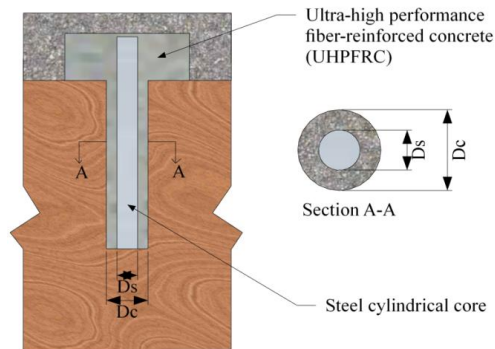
A new type of shear connector used in a TCC system (picture adapted from [41]).
